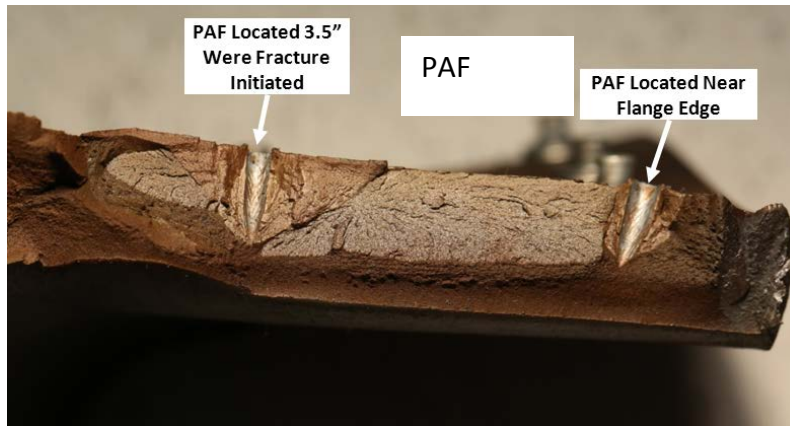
Close-Up of Chevron Markings at the Web between PAF Located 3.5 inches and the First PAF from the Flange Edge Pointing Back to the Fracture Origin Due to the Brittle Overload Fracture Mode
